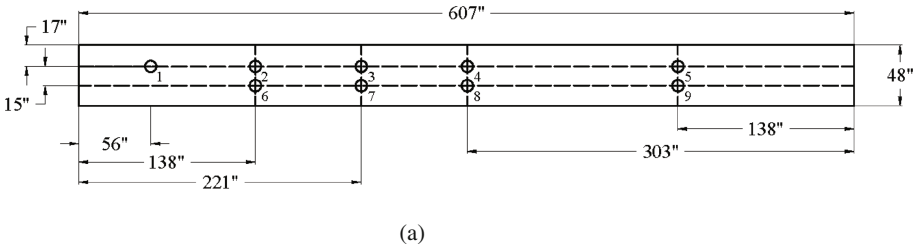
Instrumentation plan for Bent 1 of Caminada Bay bridge-substructure.
